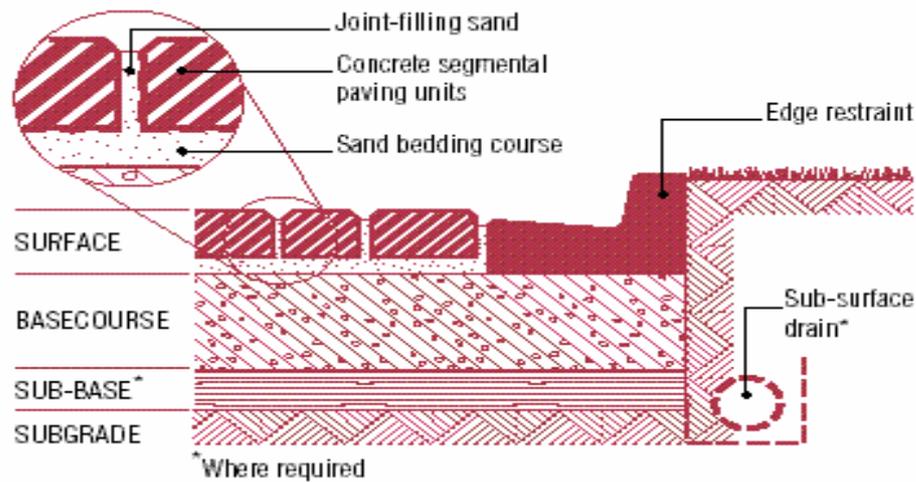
Typical Block Paving [Concrete Masonry Association of Australia 1997b].
